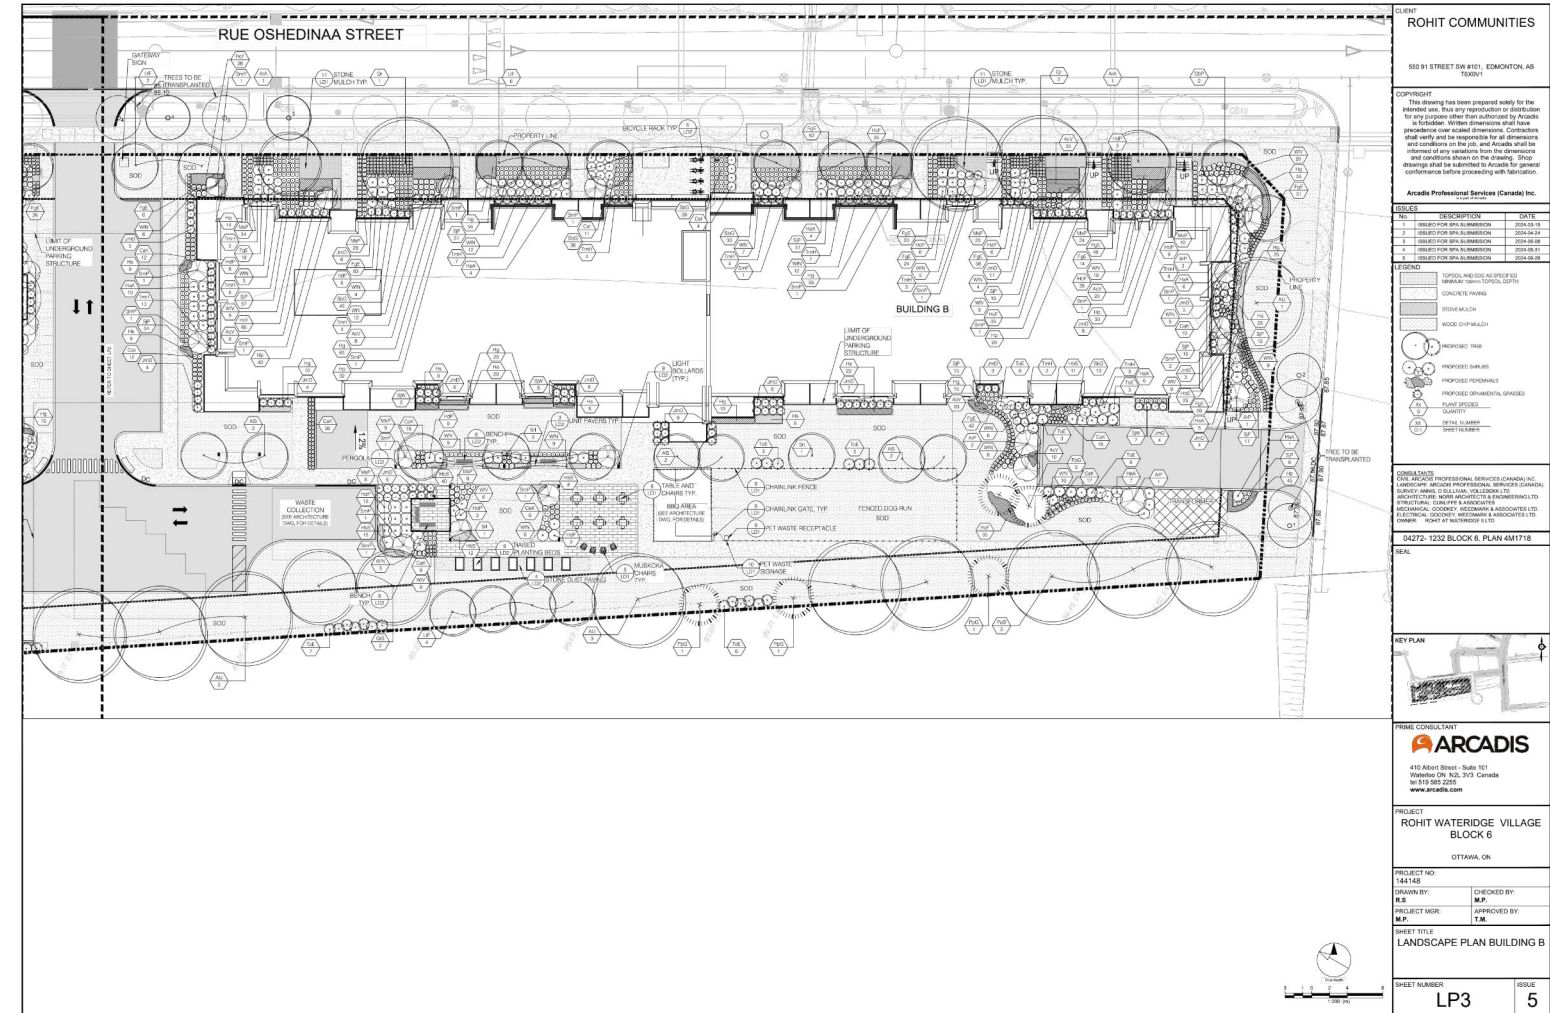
Landscape plan at Building B, courtesy of Arcadis (September 2024).
